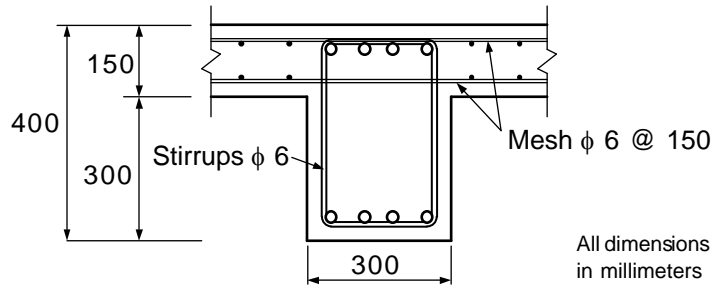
Typical Cross Section of Beam and Slab (Adapted from 4-14)
